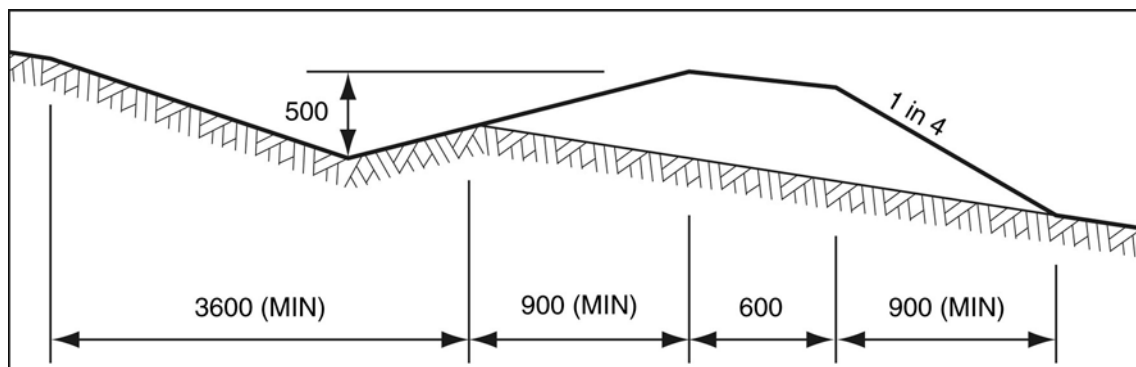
Trafficable cross bank (berm) construction (6 width)
